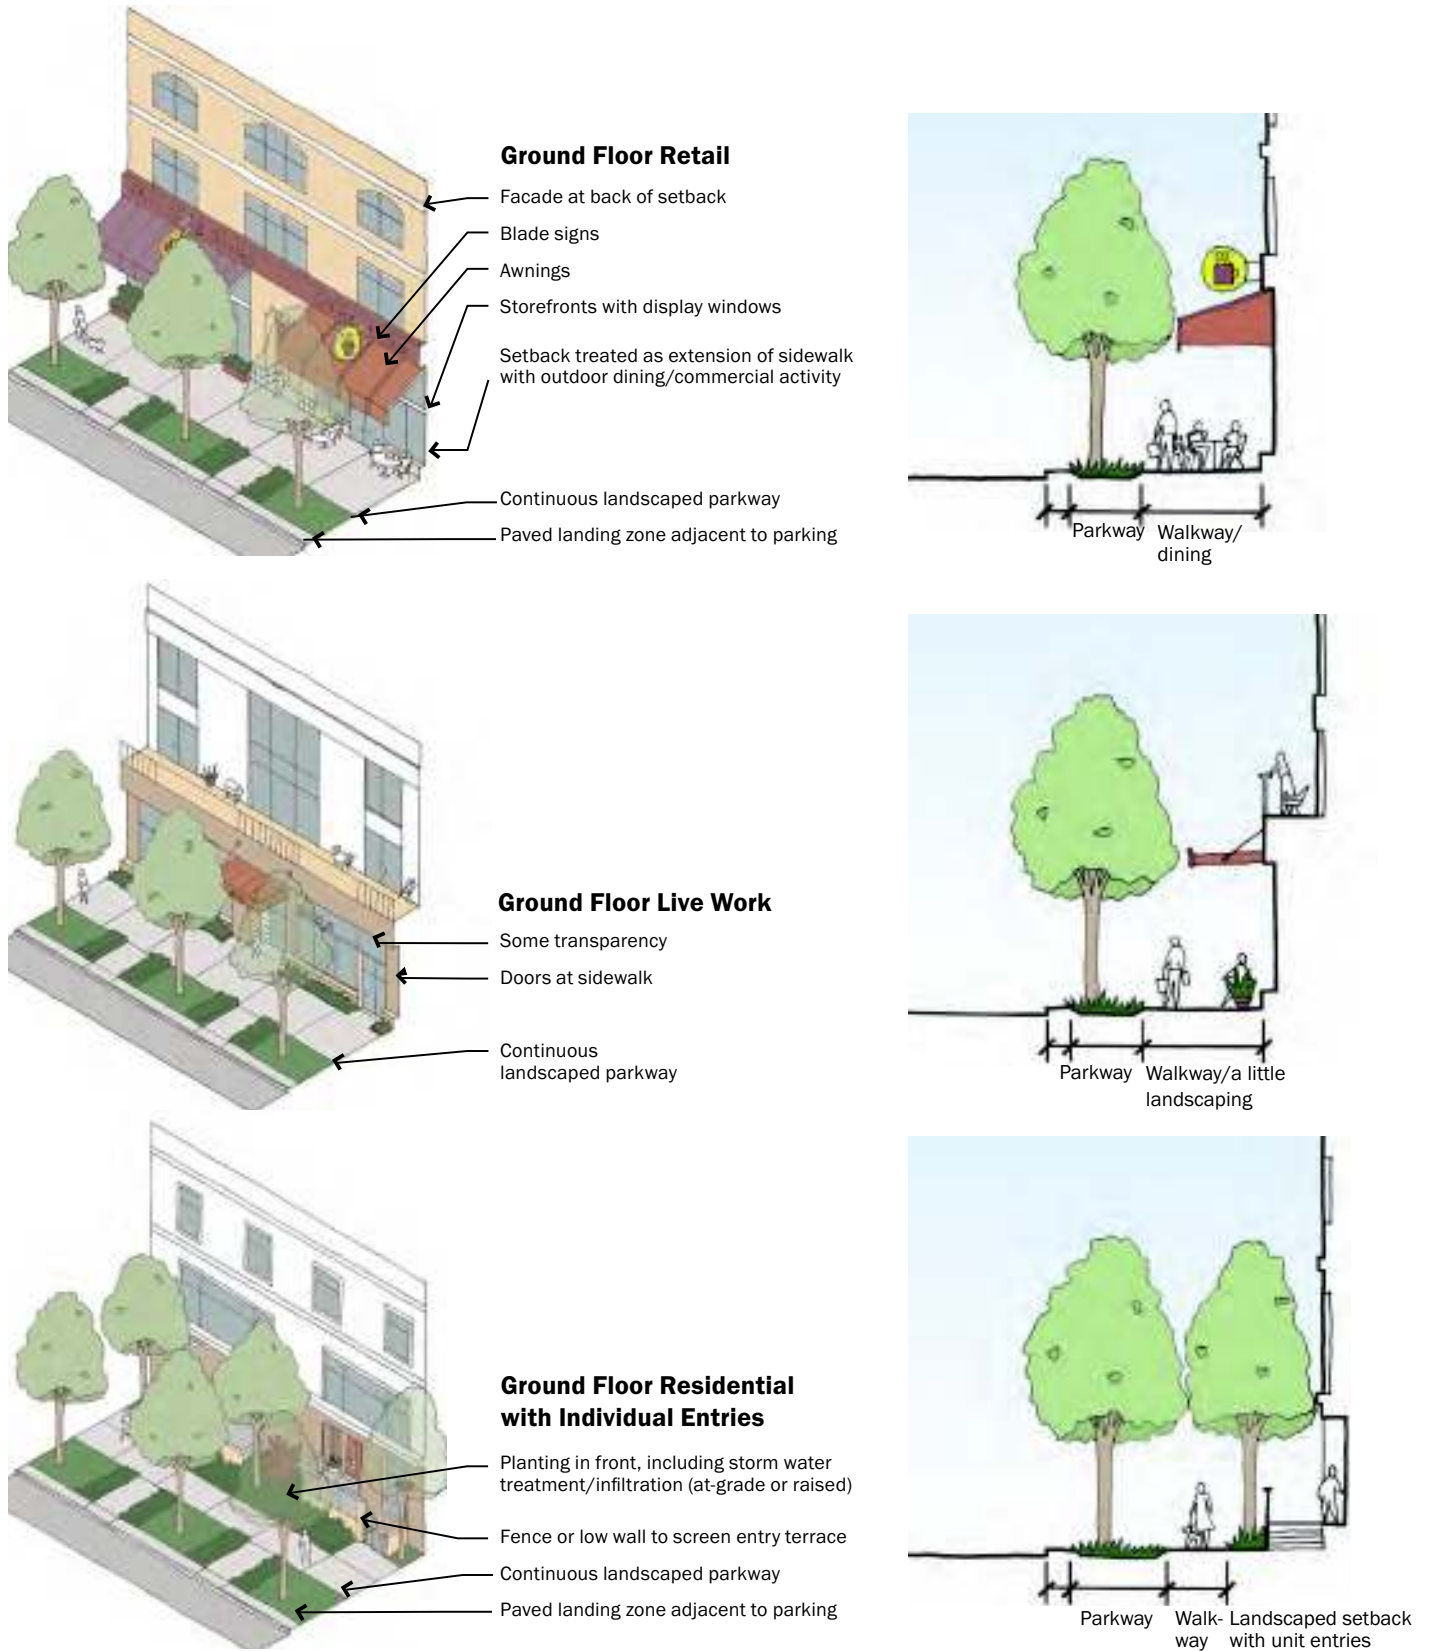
Sidewalk and setback treatment on new public or private small streets also varies with ground floor treatment.
